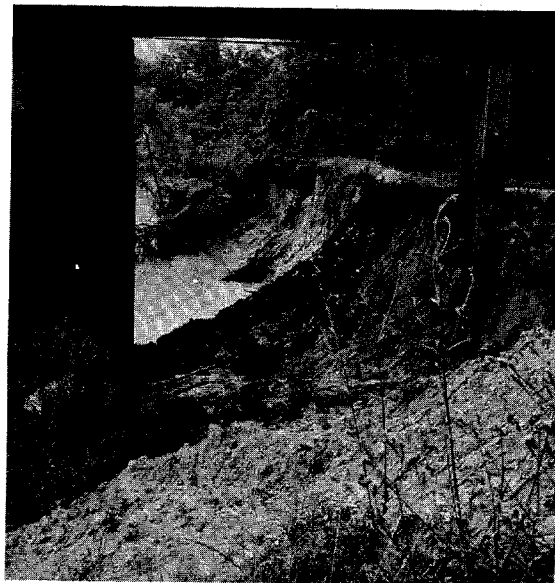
Upstream view of eroded bank at bent 9, US-84 bridge, on June 1, 1976.
